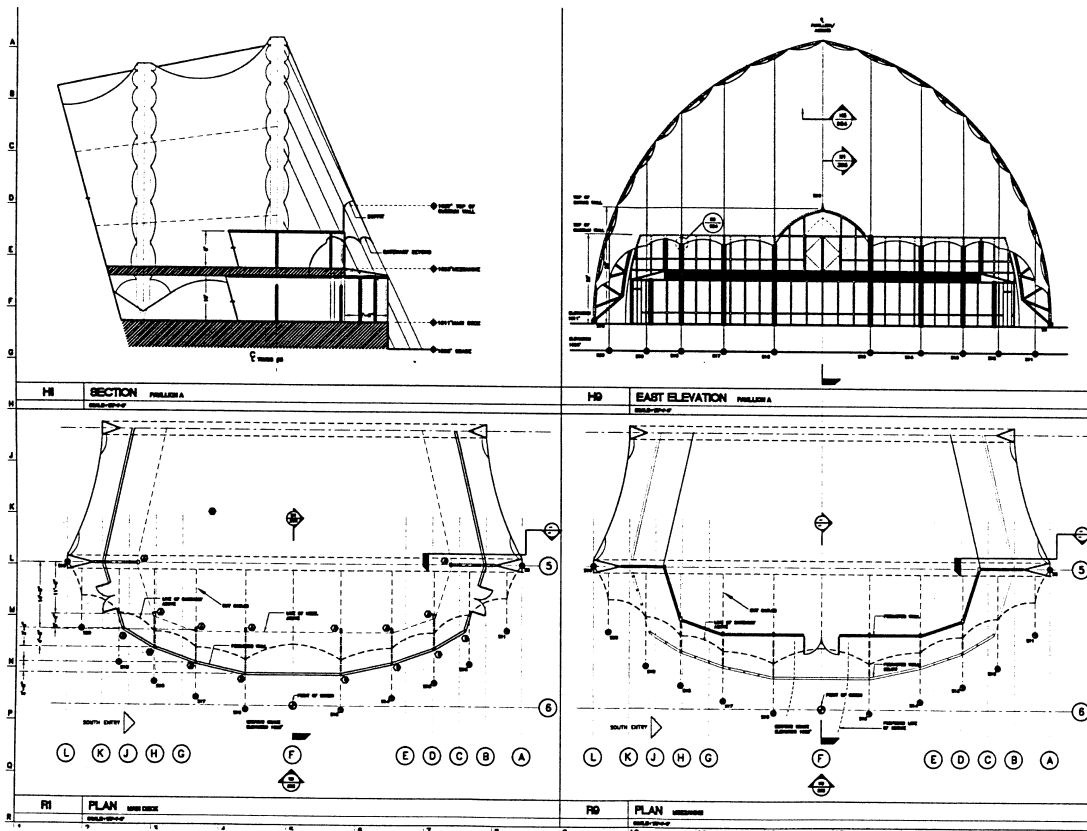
Plan, section and elevations of the pavilion end wall.
